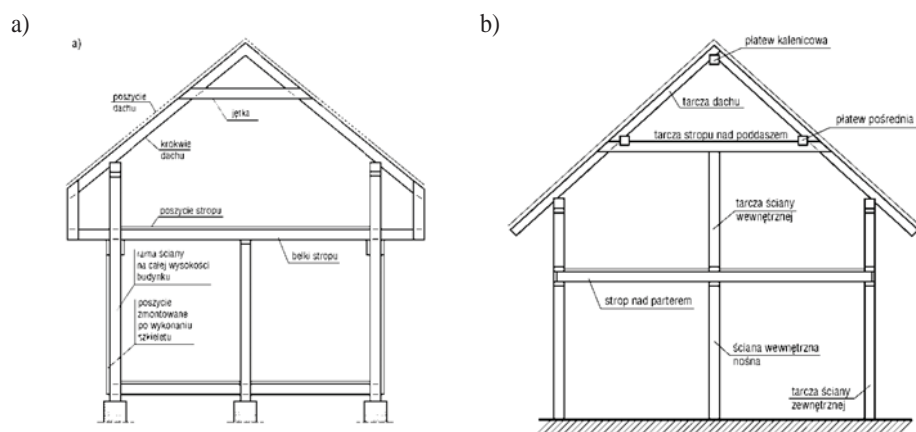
Diagram of buildings constructed in: a) Baloon Framing technology, b) platform technology.
